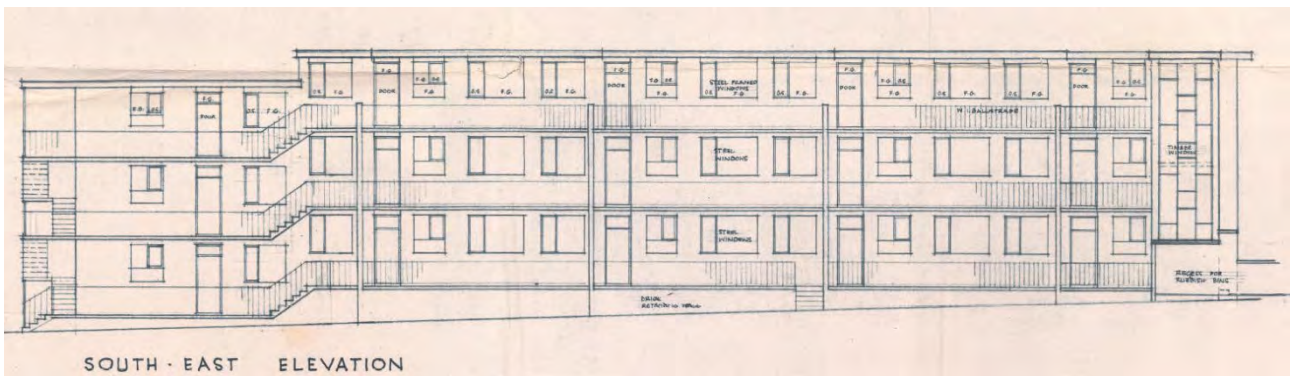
1968 drawing showing the south-east or rear elevation (Source: BP)
